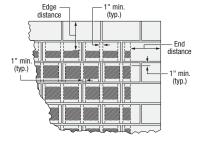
Allowable Anchor Placement in Grouted CMU Face Shell
